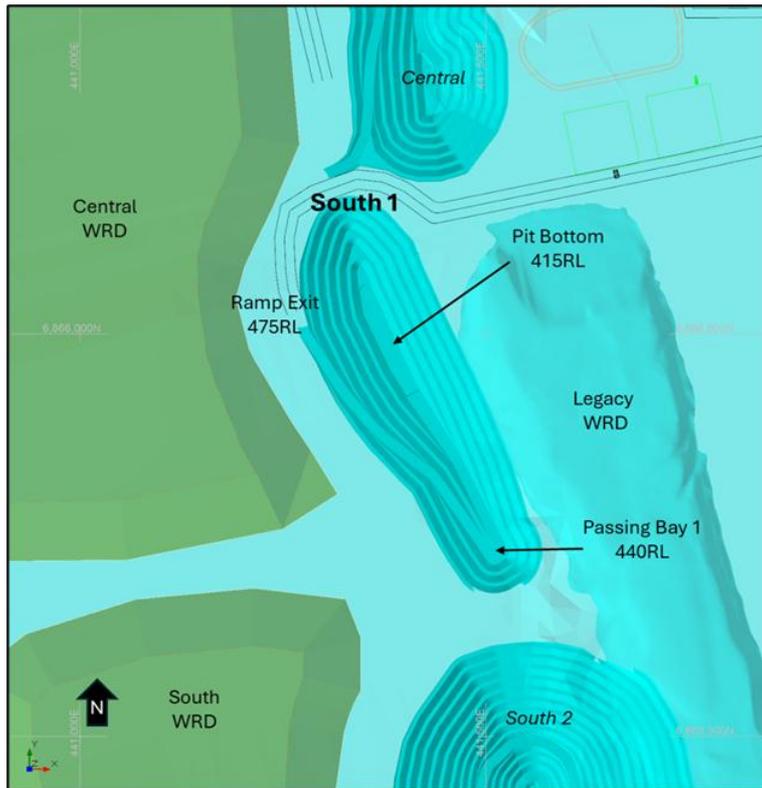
Plan view – Cork Tree Well (South 1) pit design
